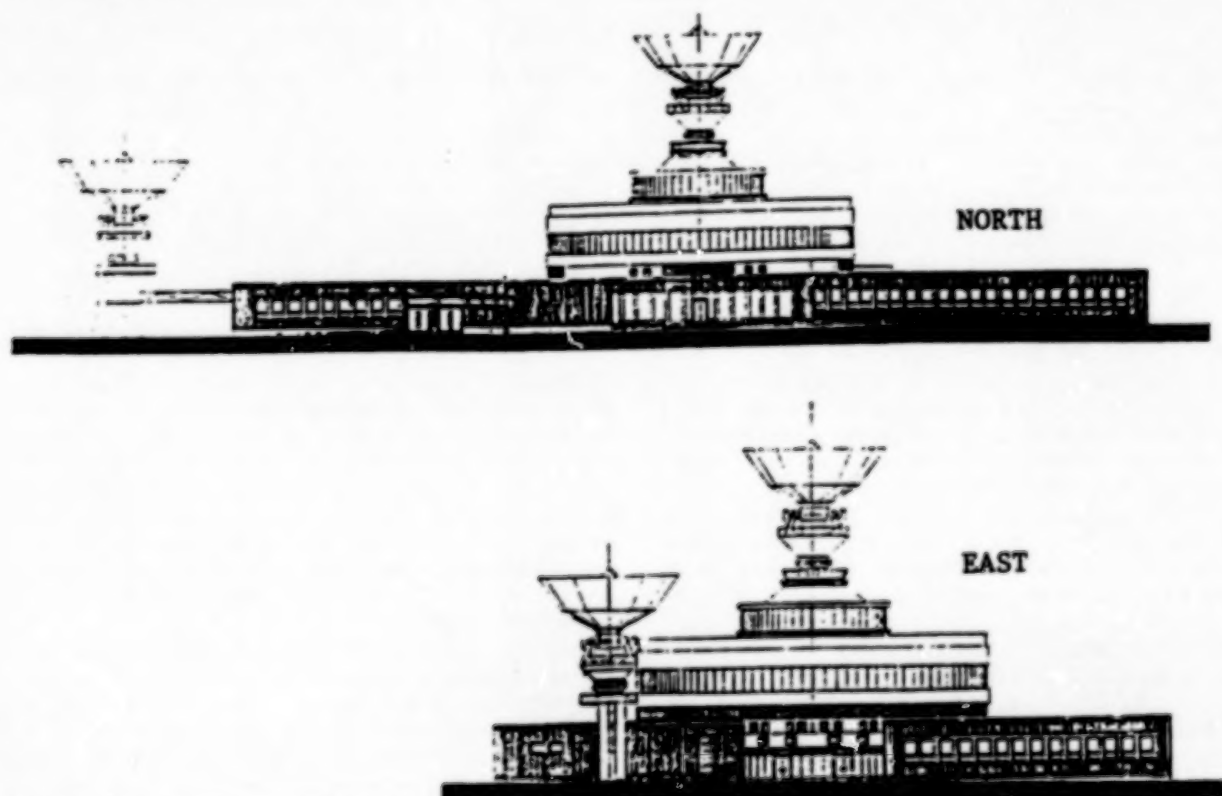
Ground Station After Completion of Second Stage of Expansion—View From the North and the East
